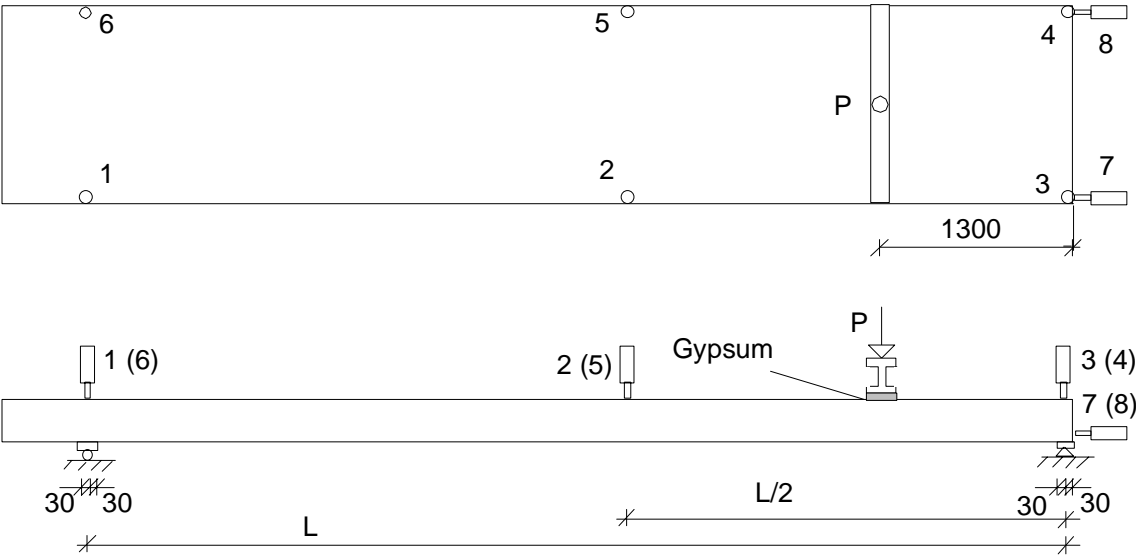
Layout of reference test. a) Plan. b) Elevation. For L, see the next Table.
